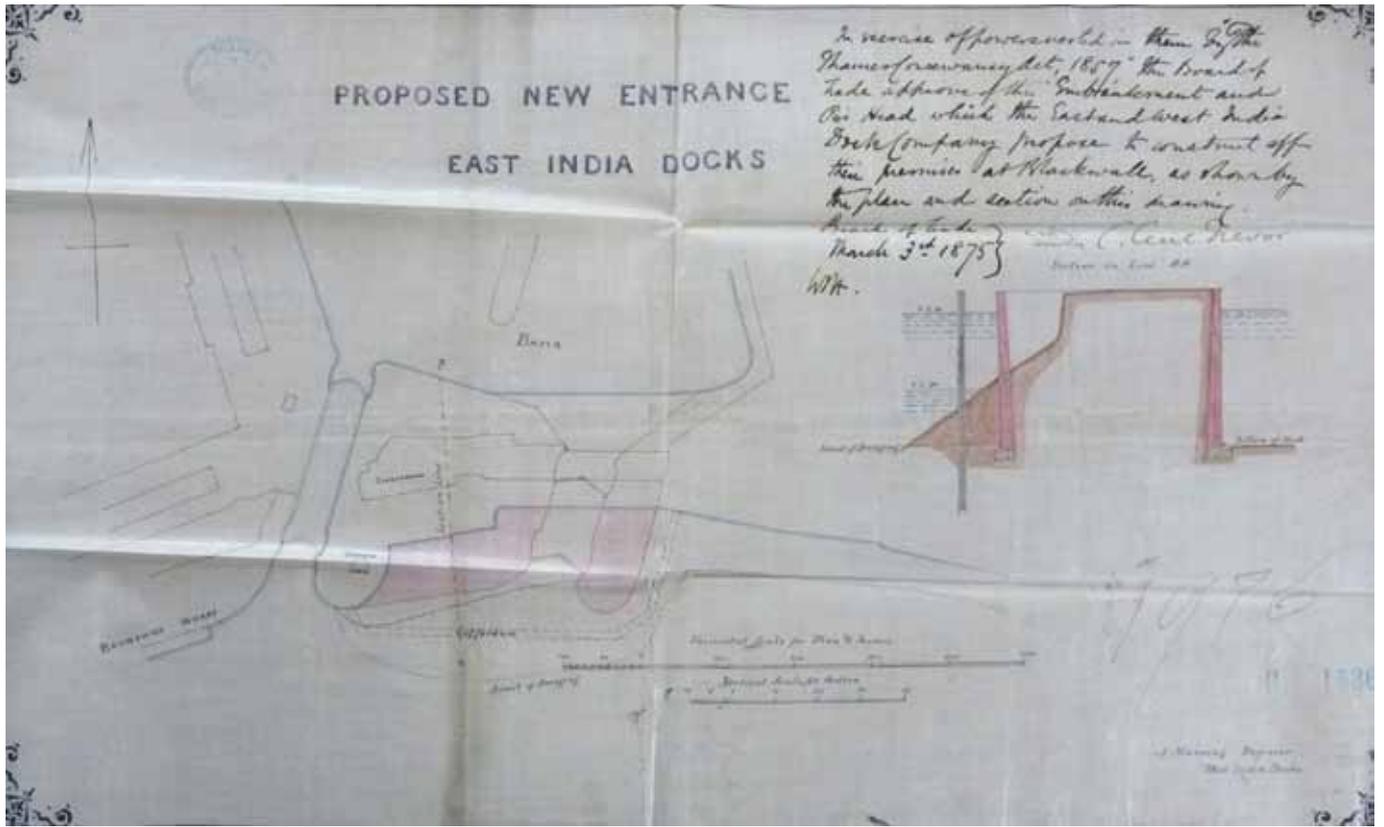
Plan of Proposed New Entrance to the East India Docks, 1875 (TNA)
